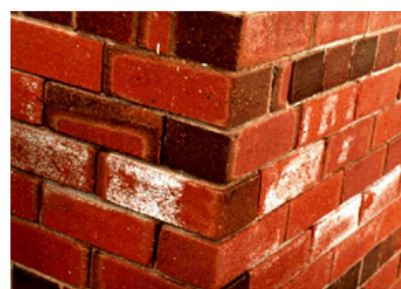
Salt damage in the brickwork of buildings identifies a possible salinity problem in the area.
